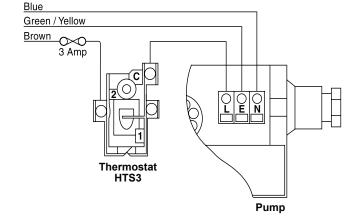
HTS3 Wiring diagram - When hot 2 and C make contact
